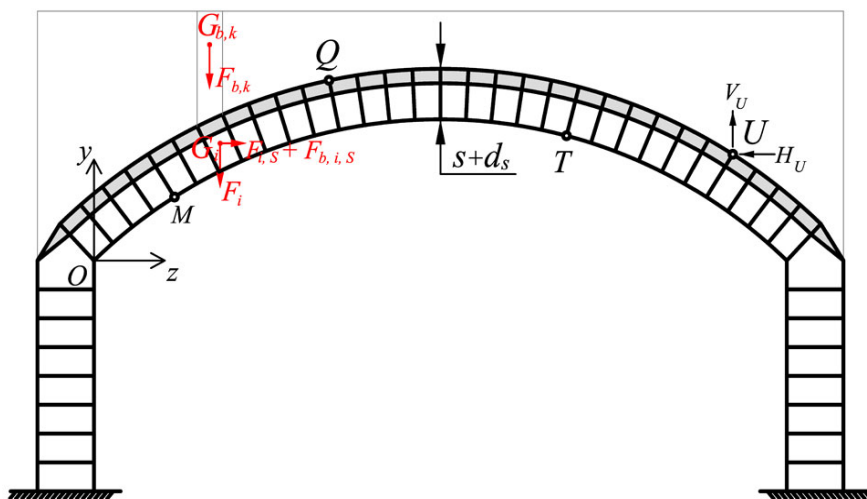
Consolidation by a concrete saddle at the extrados of the arch.
